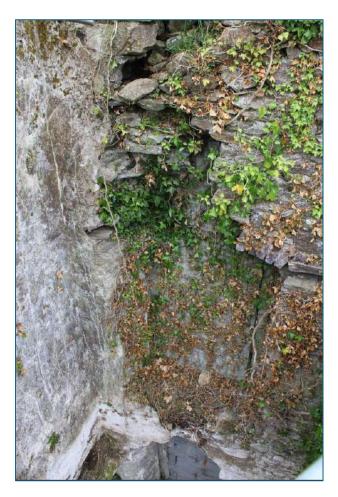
View of southern elevation of barracks at location of window on first floor level.
